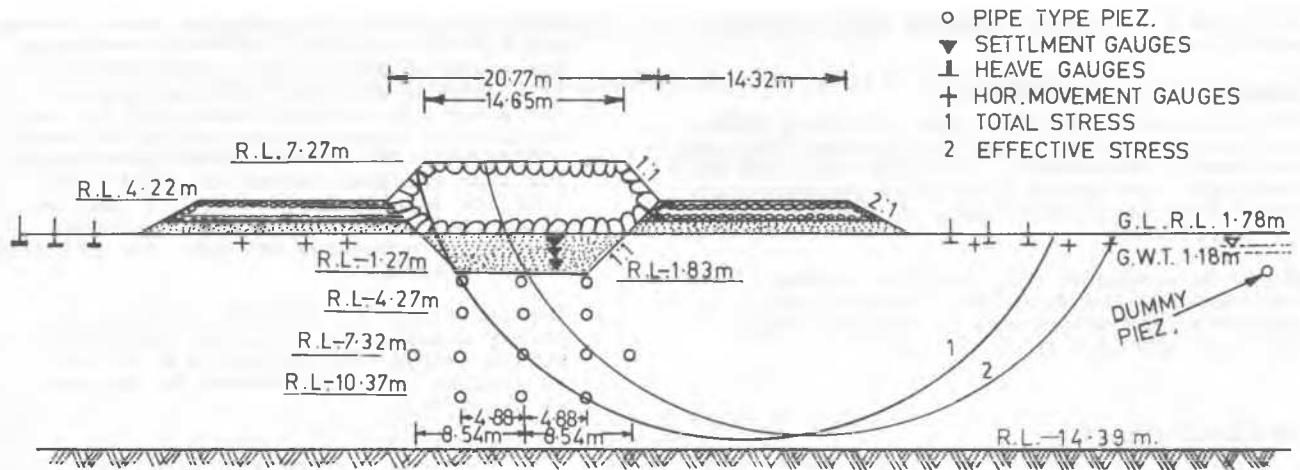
Approach Road Embankment at Bassien Bridge Site
